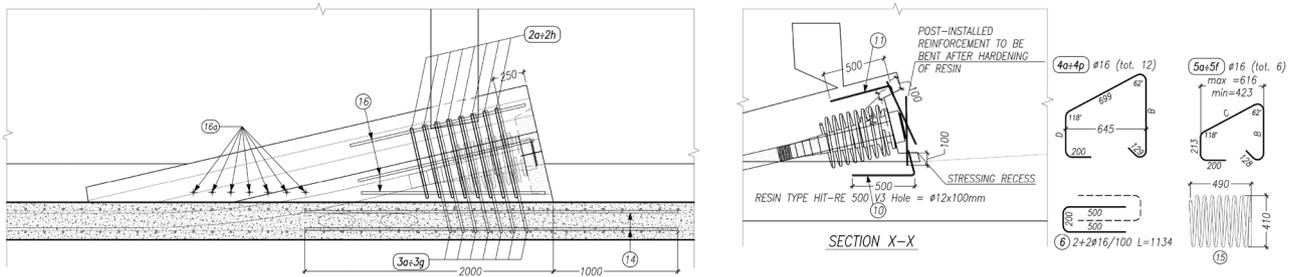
Detail of the executive draw of a blister of a recent prestressed concrete bridge.
